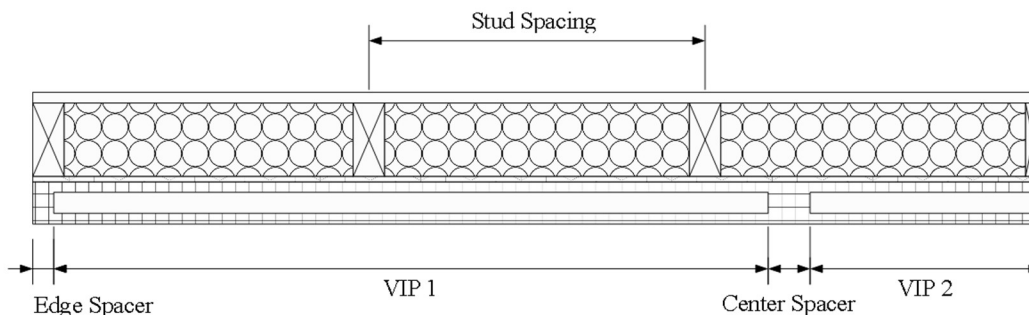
Horizontal cross section with dimensions labelled. Dimensions for each wall assembly found in Table 1
